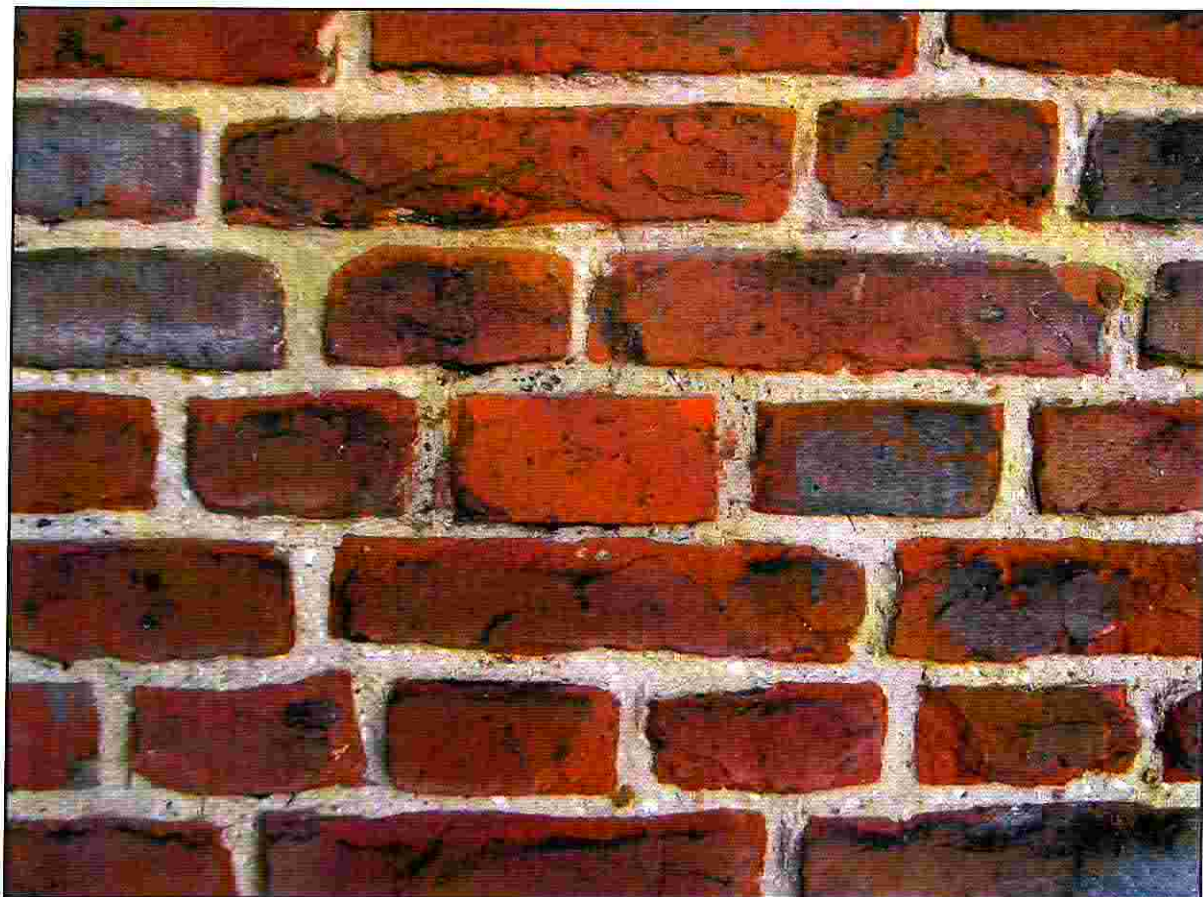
Chapel Court, North Facing Elevation - Red paint on 19th century repair bedding mortar
